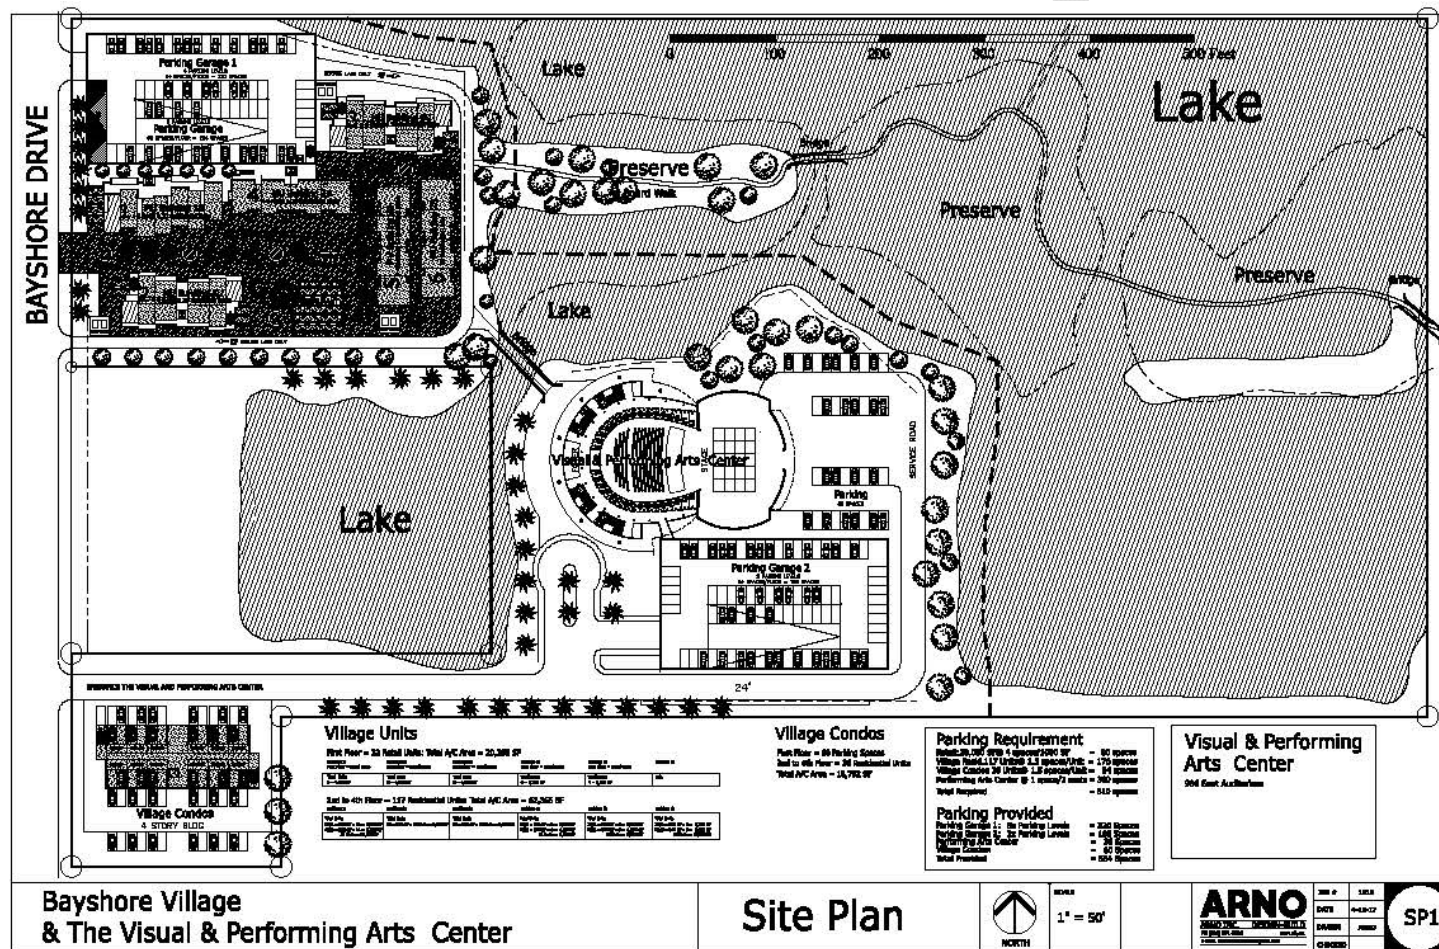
Pedestrian path Site Plan for Cultural Arts Village at Bayshore PUD
